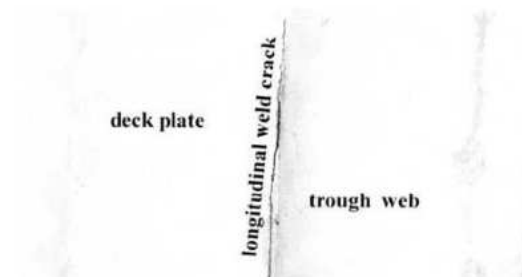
Visual observation crack in the longitudinal weld trough – deck plate
